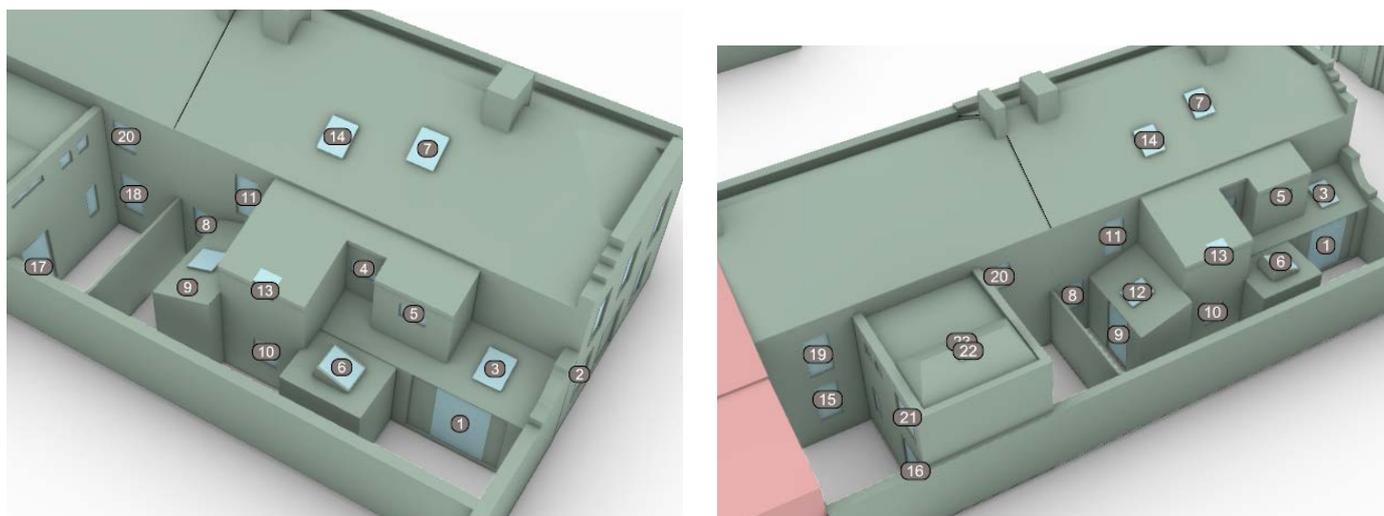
No.5 Sussex Street & No.11-12 Eblana Avenue - View of model locating APSH test points
